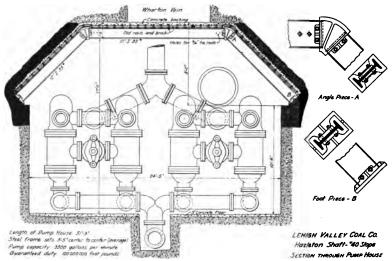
, Concrete Lagged, Steel Framed Pump House, Lehigh Valley Coal Co., Hazelton, Pa.; built in 1897.
